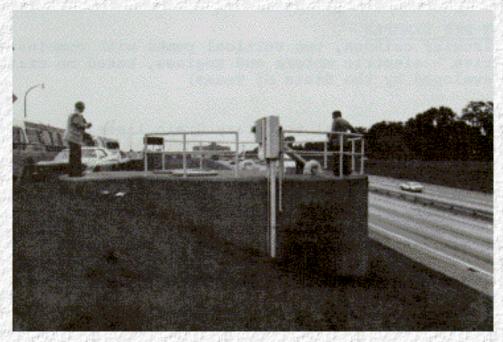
Wet-Pit Pump Station, Caisson Type, Southfield Freeway at Rotunda Drive, Dearborn, Michigan
